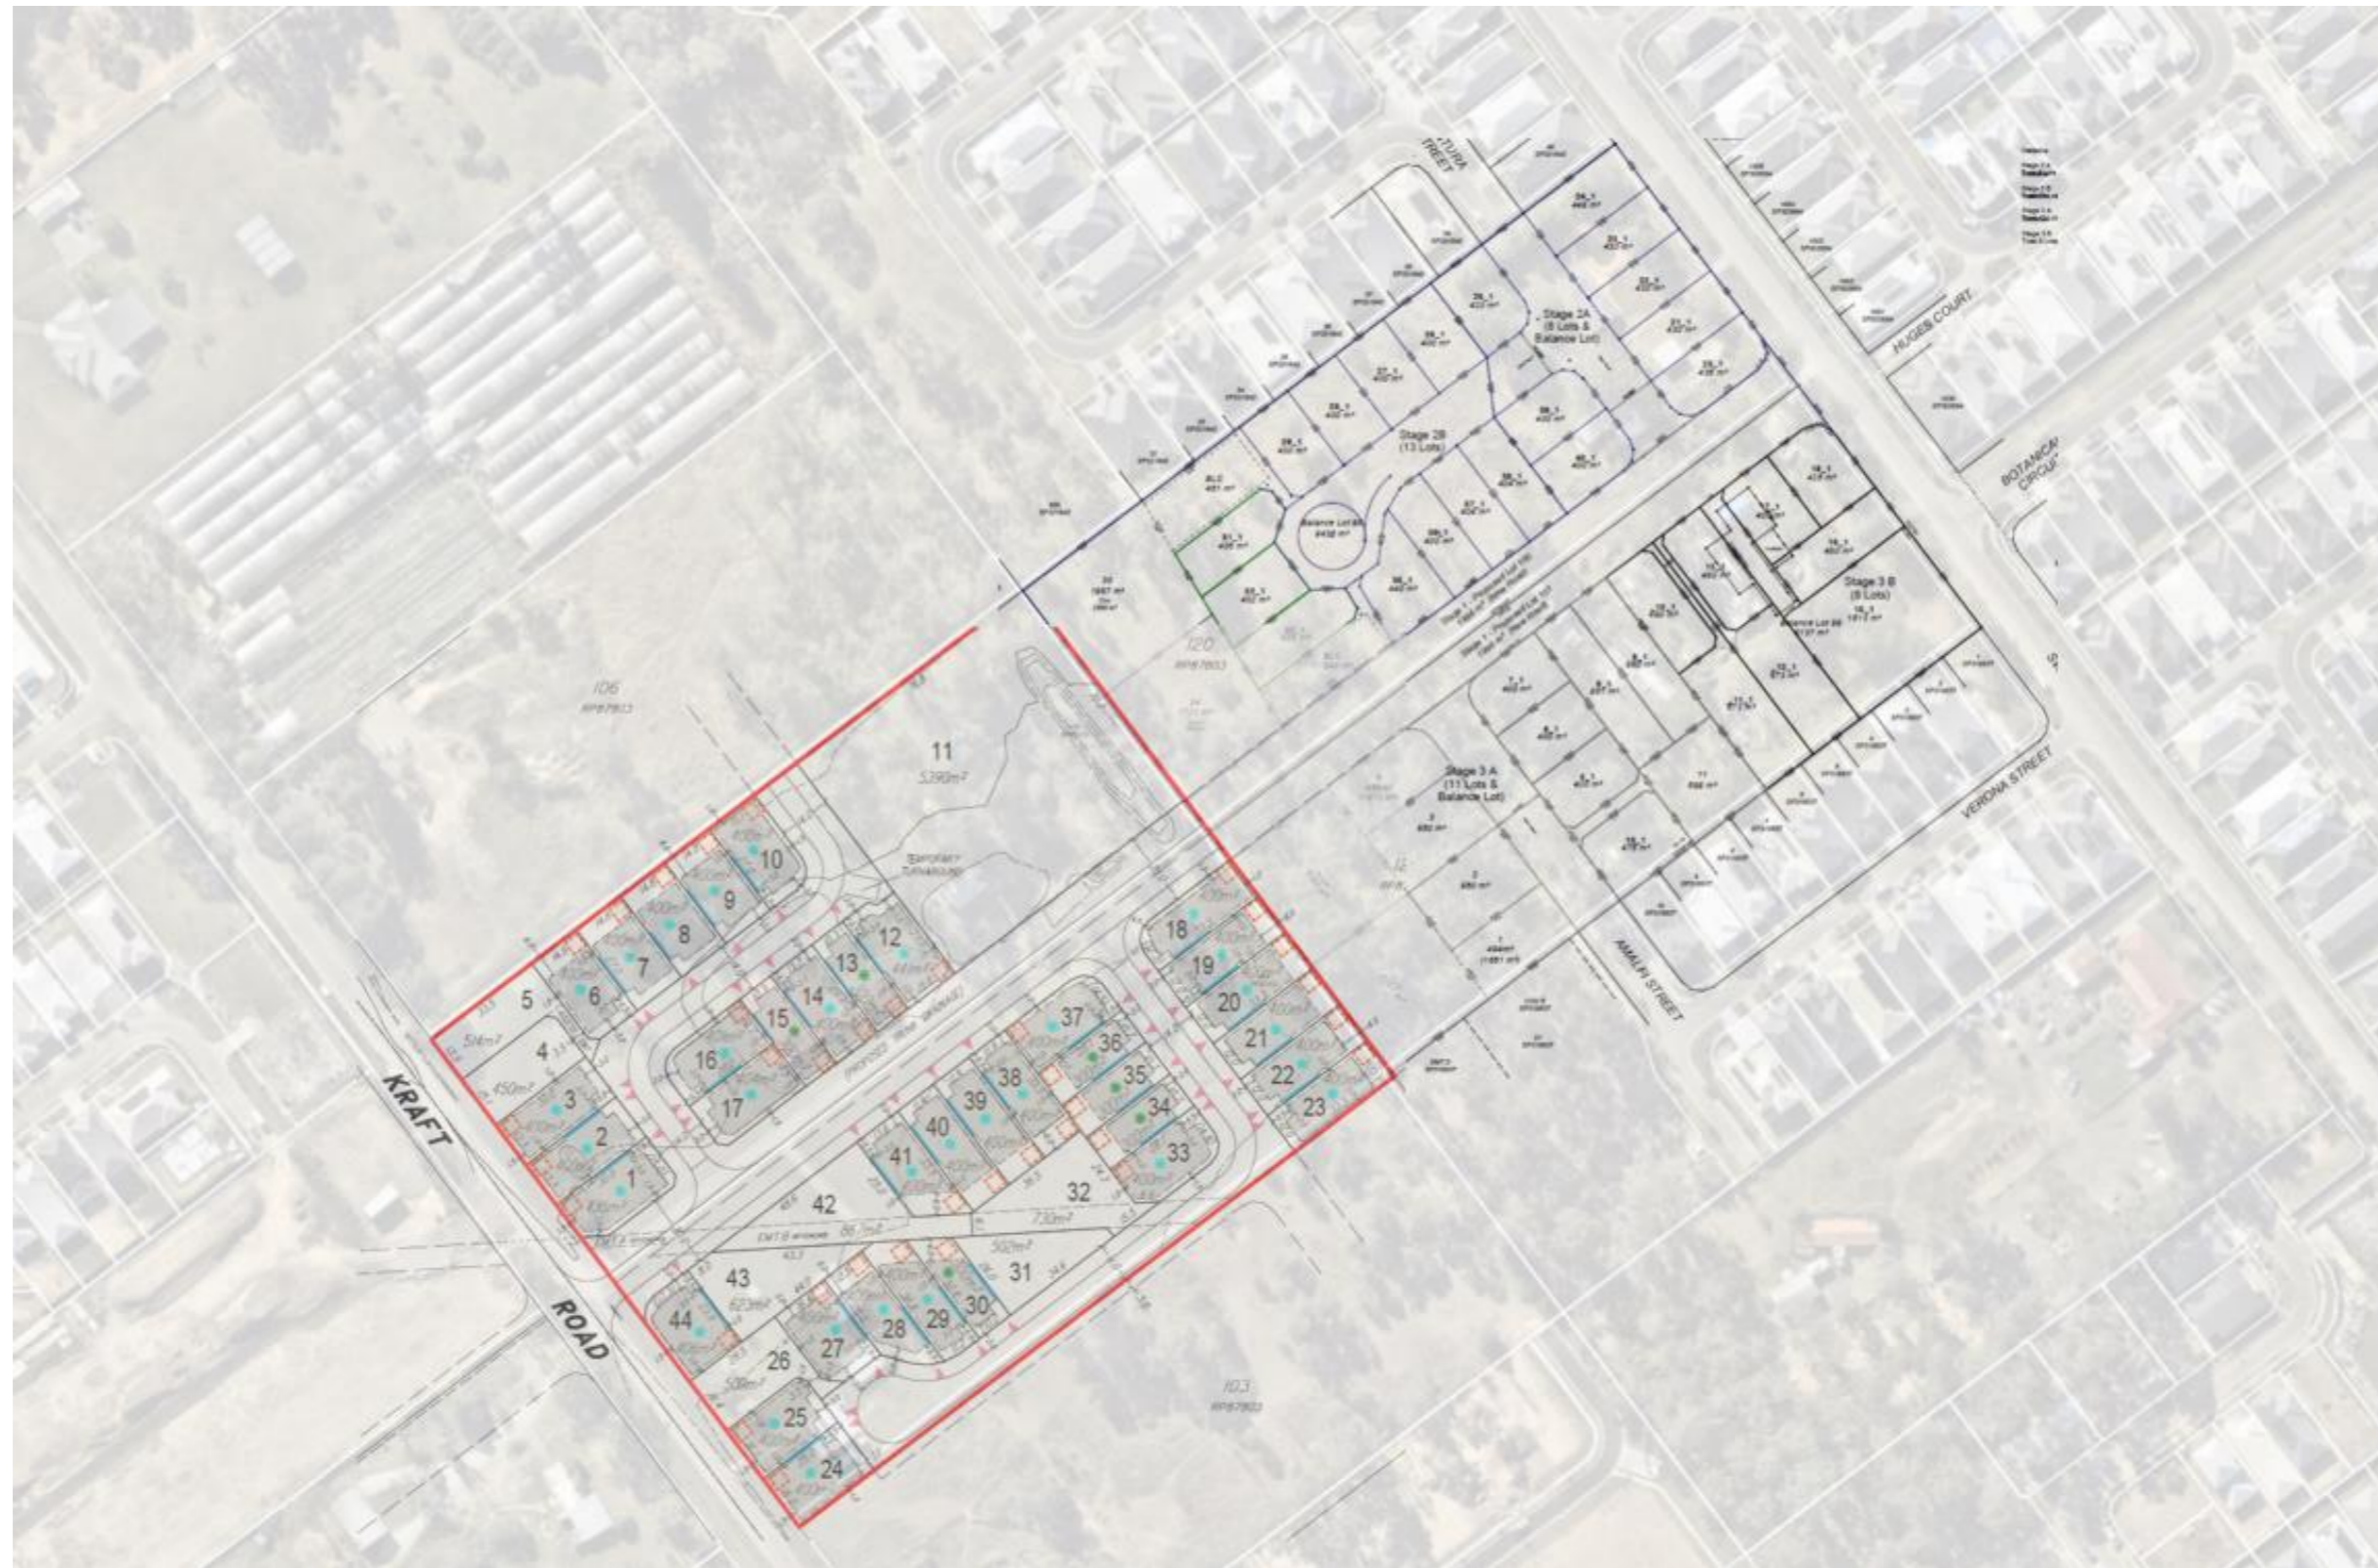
Structure Plan demonstrating connection and delivery of infrastructure to the southwest (70-79 Kraft Road)
